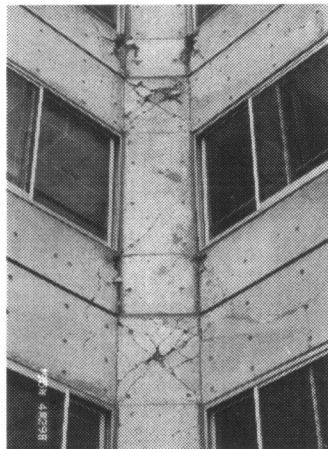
An 11-story SRC City Office building with damaged secondary walls and severe damage of joints
